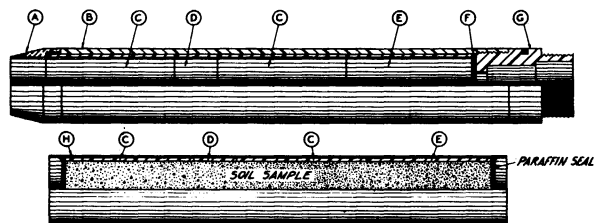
EQUIPMENT ASSEMBLY FOR SHEAR TEST OF
